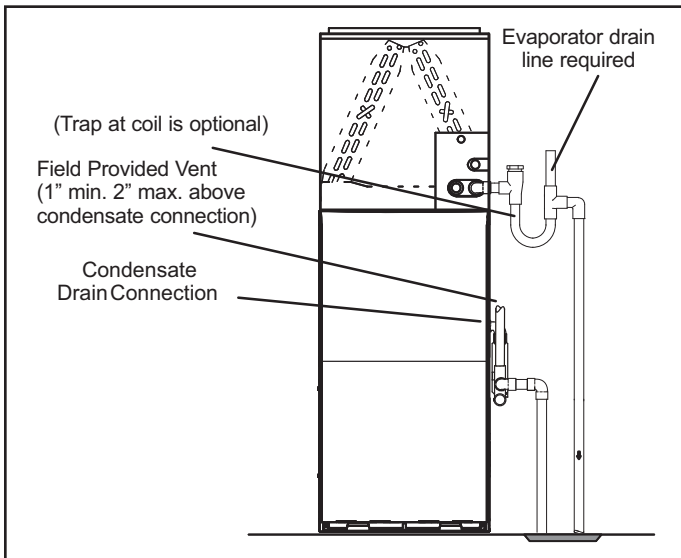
Furnace with Evaporator Coil Using a Separate Drain
